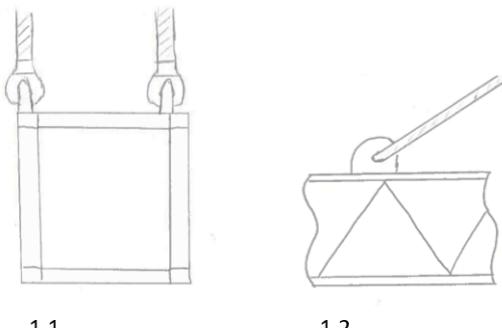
Front view boom support (1.1) and side view boom support (1.2)
